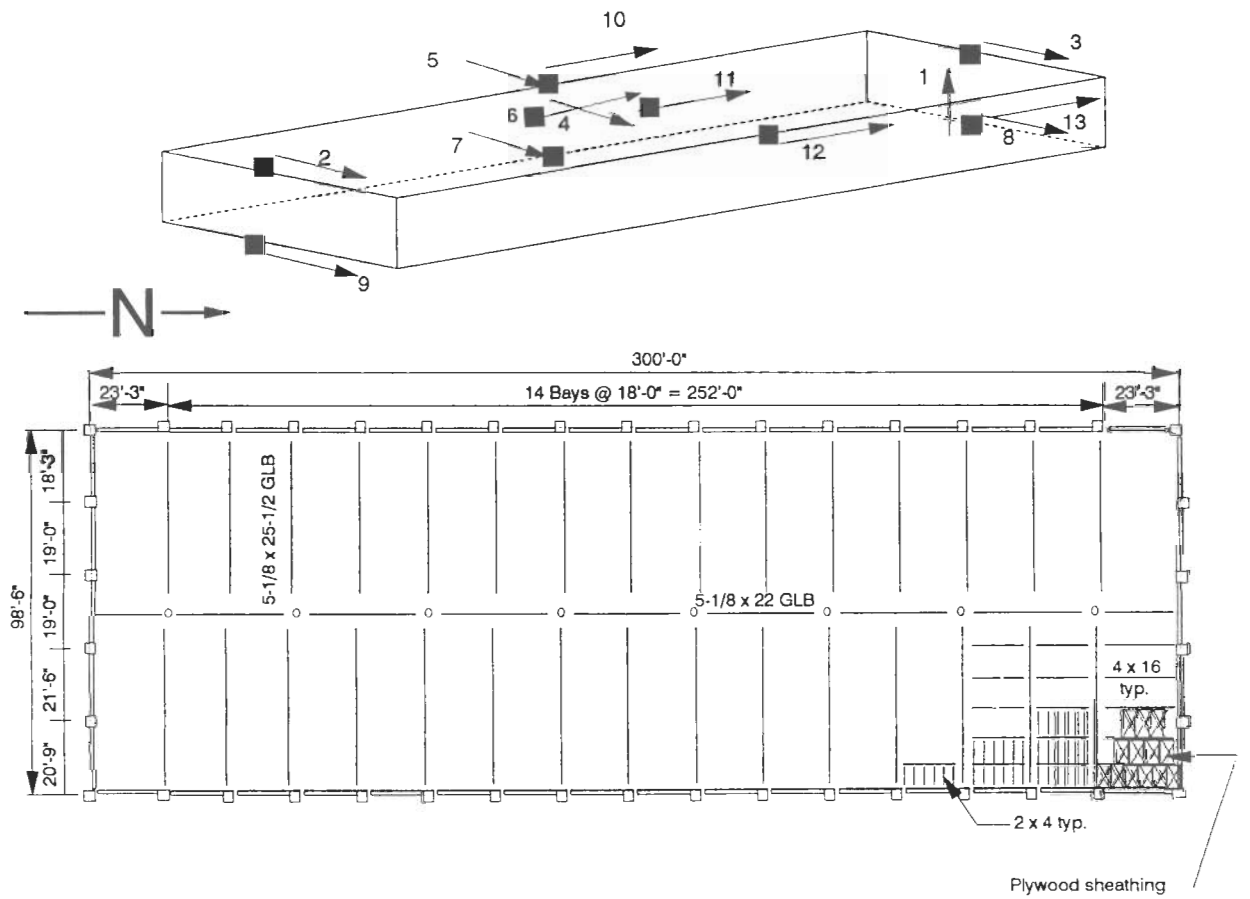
Hollister Warehouse, Roof Plan and Sensor Layout
